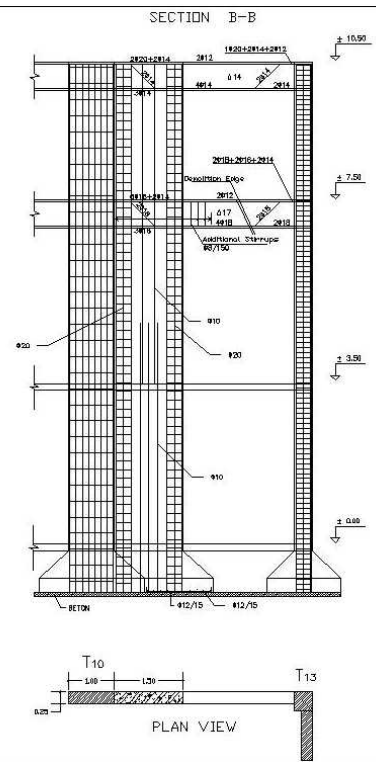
F: Seismic Strengthening - Installation of a New Shear Wall
